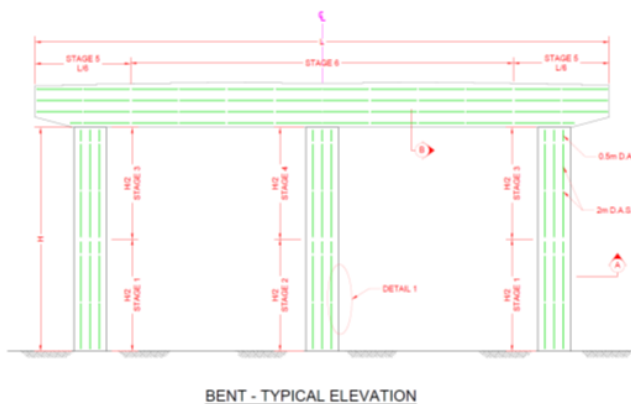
Distributed Galvanic Anode Layout for a Typical Pier and Pier cap
